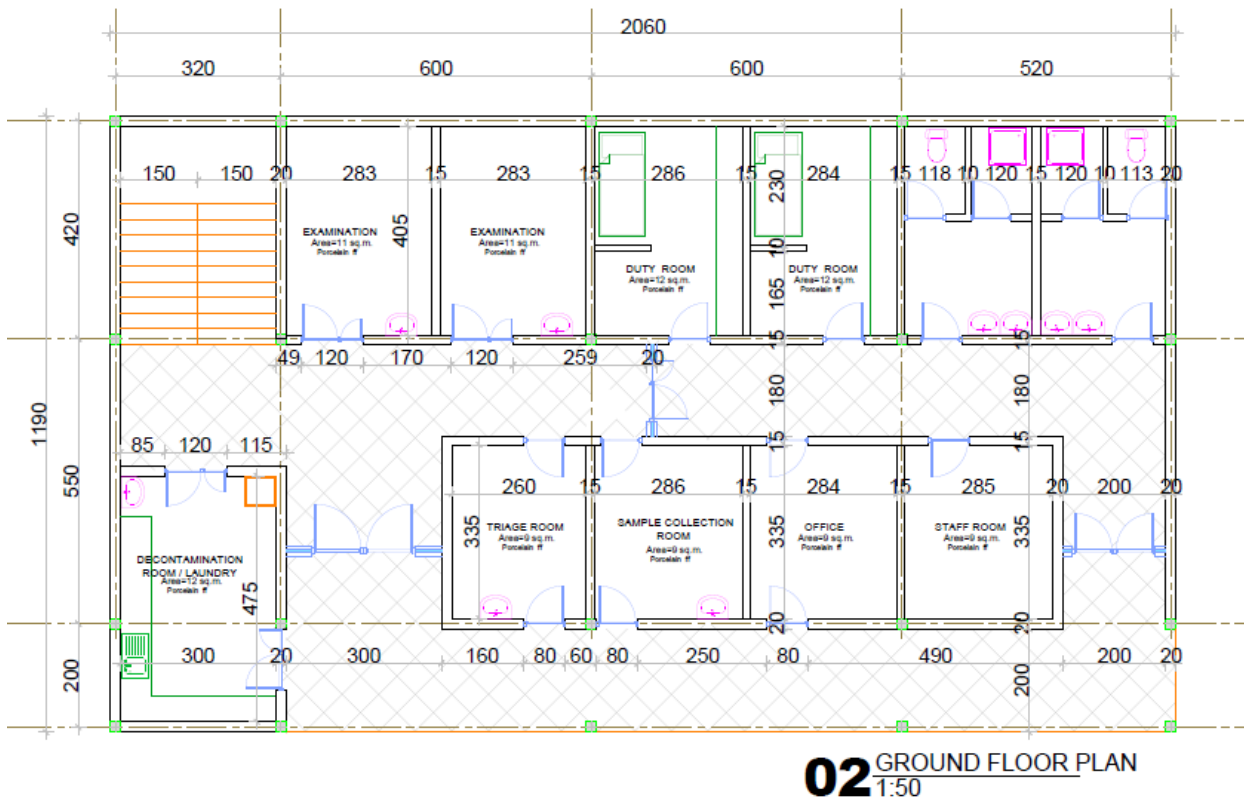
Proposed Bole Airport Isolation Center Construction Site
